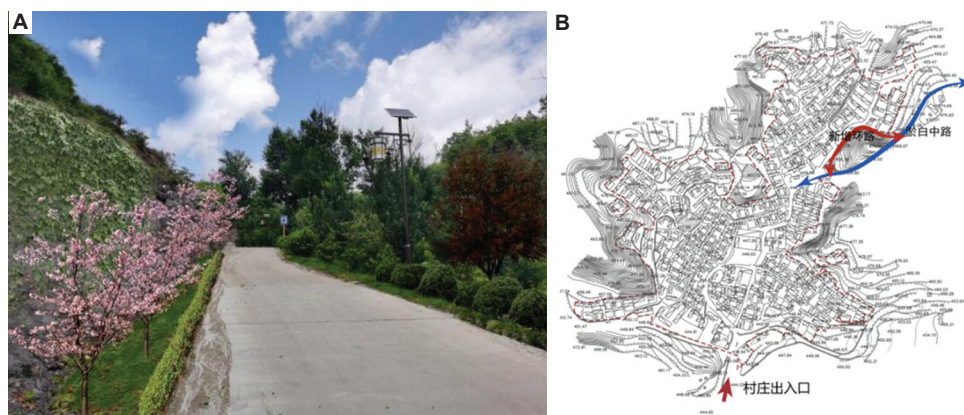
(A) Landscape enhancement effect of Silber White South Hill Road. (B) Proposed plan for the renovation of Silber White Middle Road. Source: Photo and drawing by the authors
